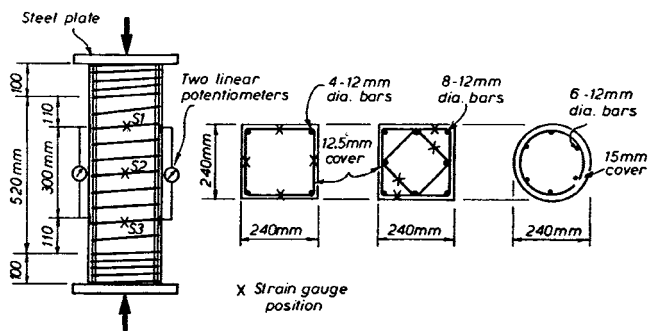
Short column with axial compressive loading: principal dimensions; test setup; instrumentation; and position of strain gages.
